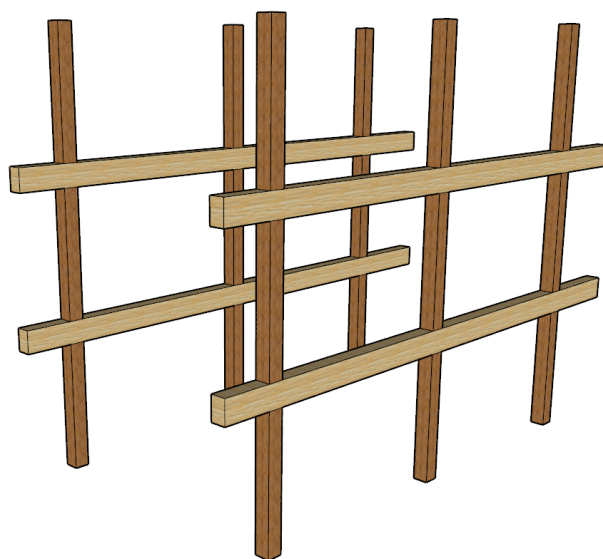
Conceptual sketch of continuous girder frame system
